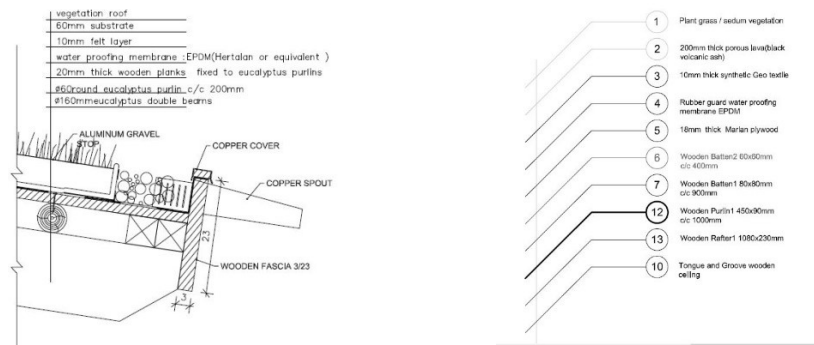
Section drawings, showing various construction details on the green roof of the Gulele HOAREC building with its green roof. Source: ABBA architects plc.
